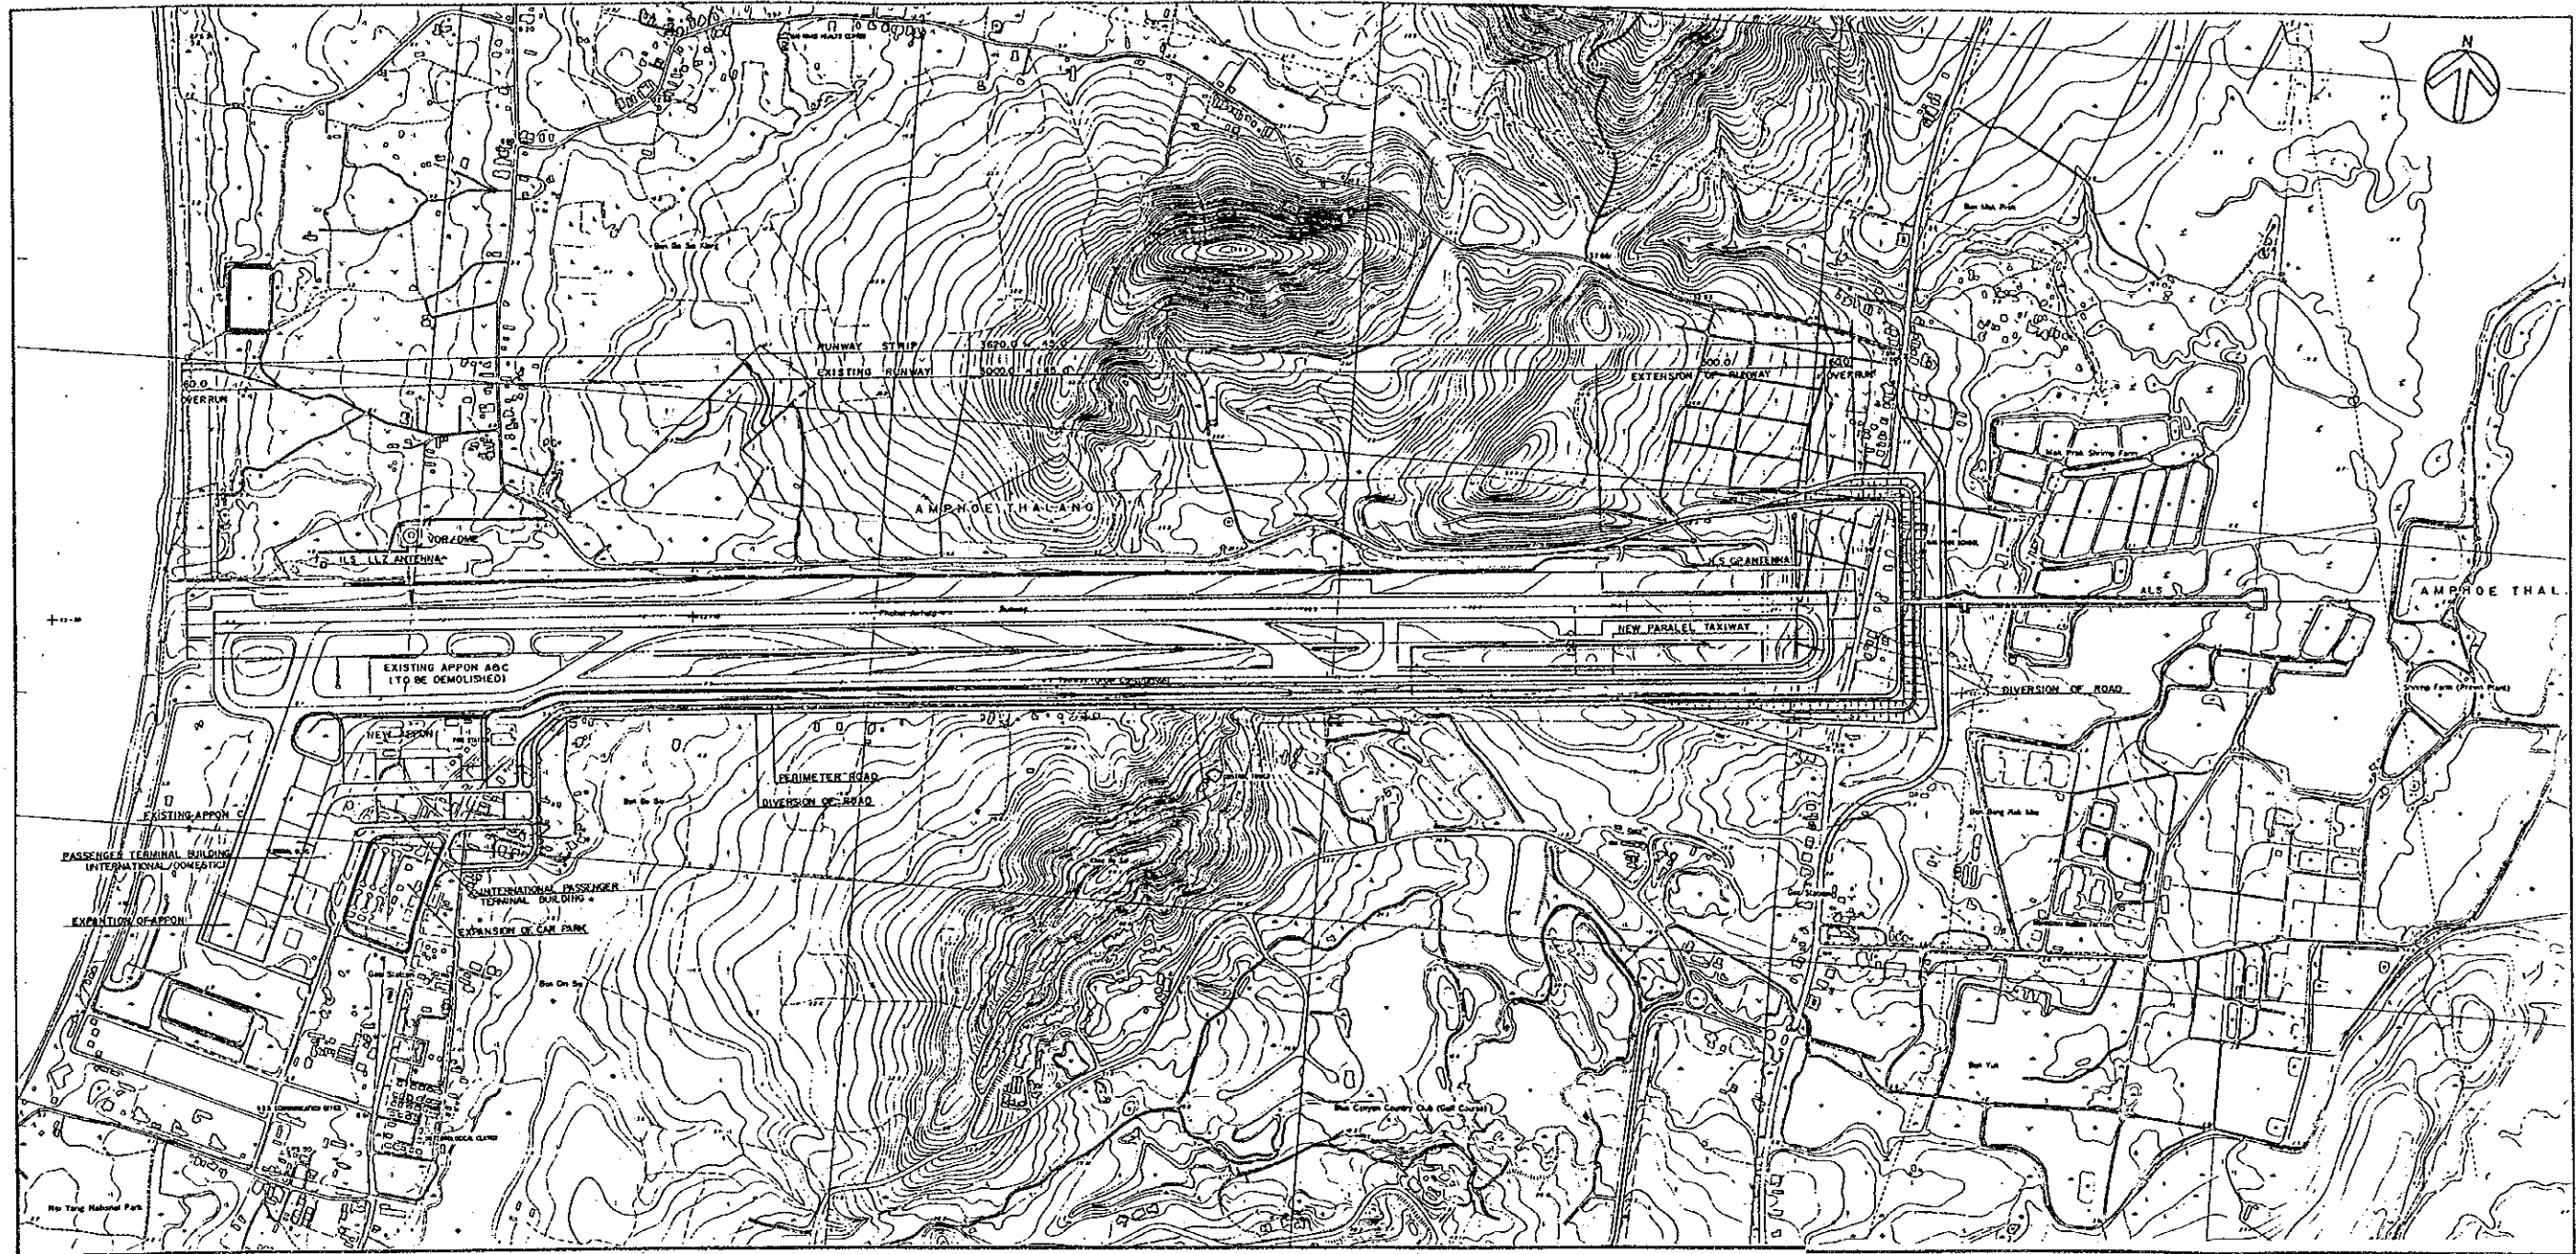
Layout Plan of Alternative-1 (S = 1 : 15,000)
